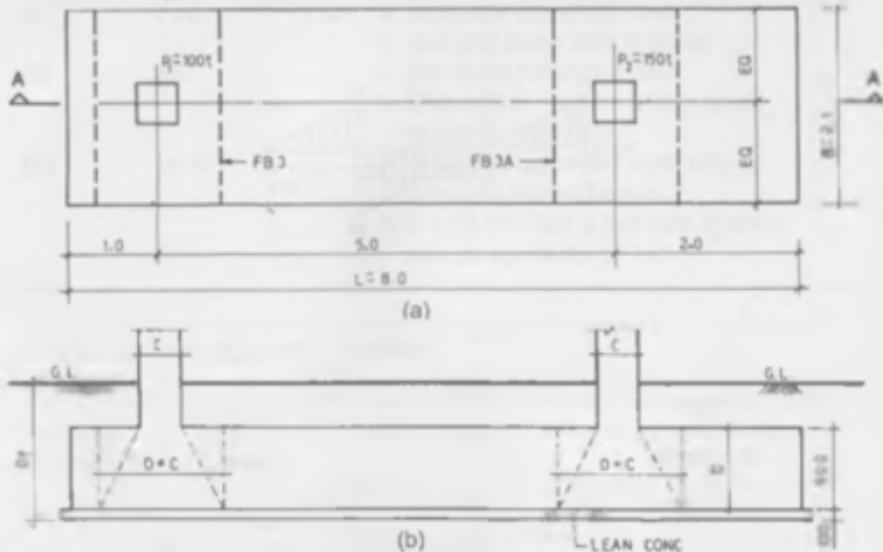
A. Plan and section of slab type combined footing. (a) Plan; (b) Section A-A.
